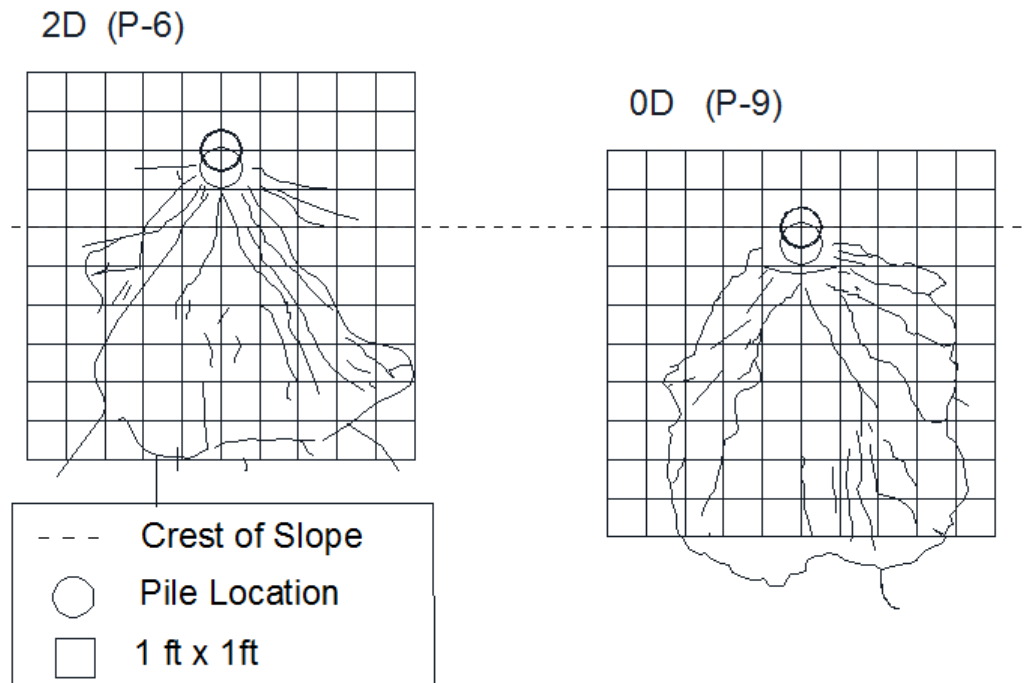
Cracking patterns for the 2D and 0D test piles
